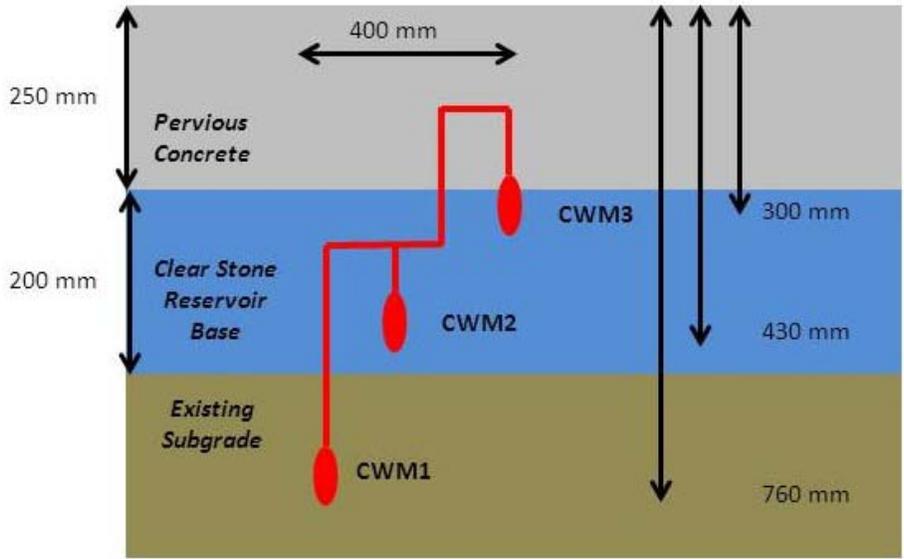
Moisture Gauge Sensor Tree C at Site 3B
